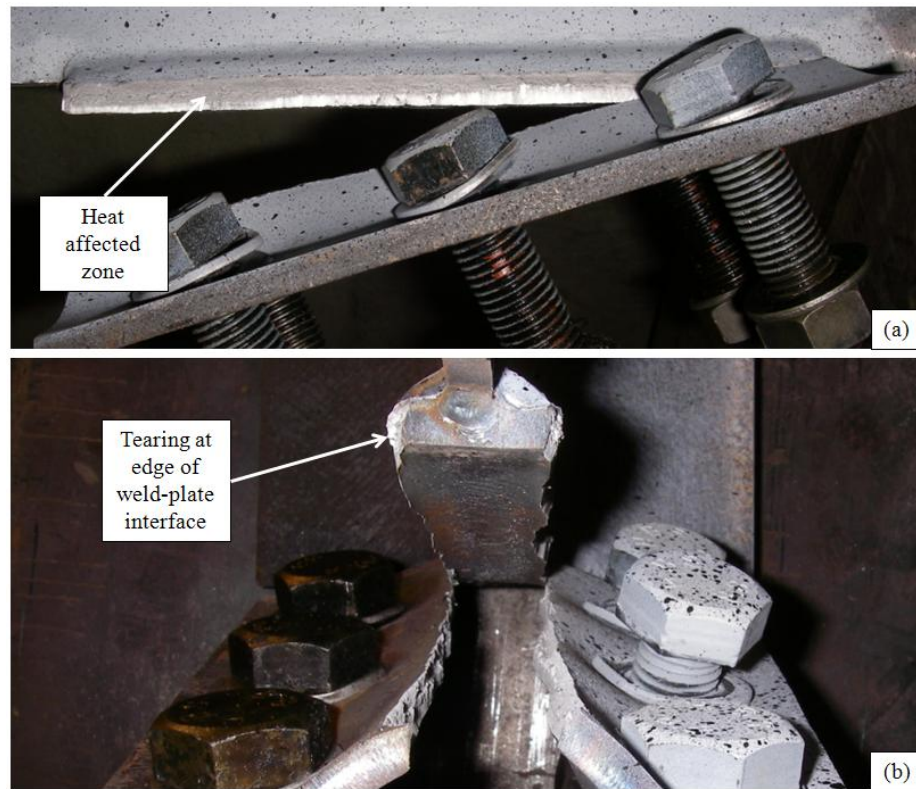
Typical 8mm end-plate failure showing tearing at root of weld
